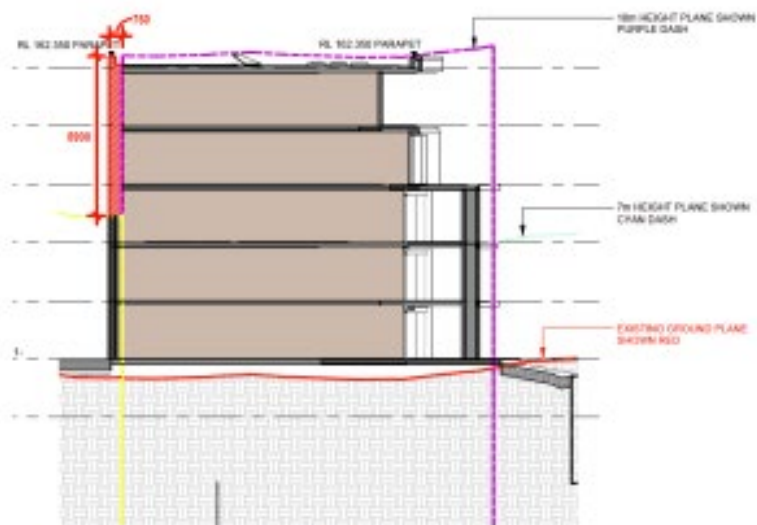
Cross section 3 – Building B (Cox drawing DA-99-06)
